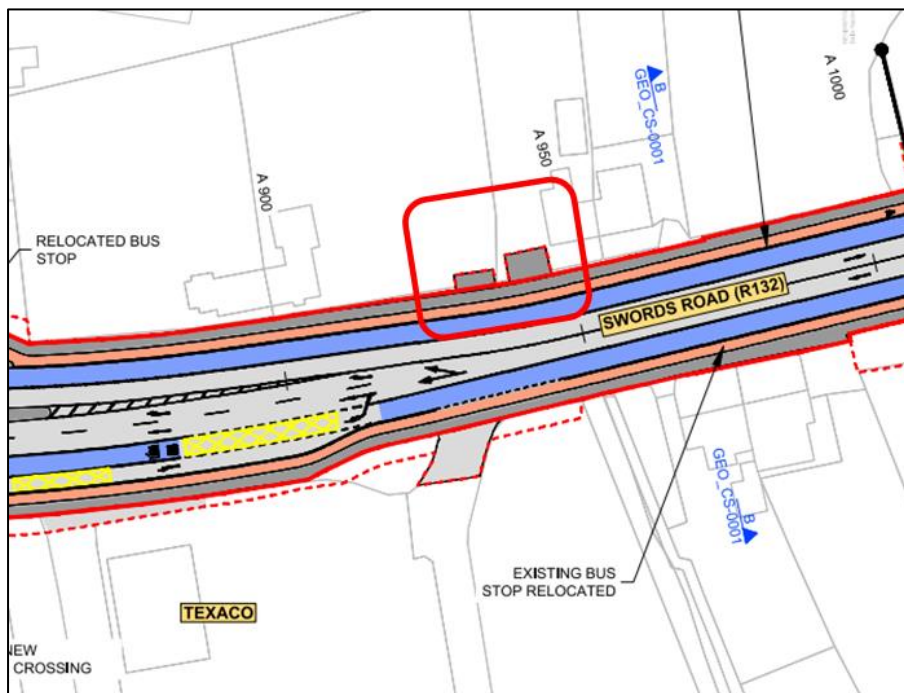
Proposed new Layout on the Swords Road (R132)
